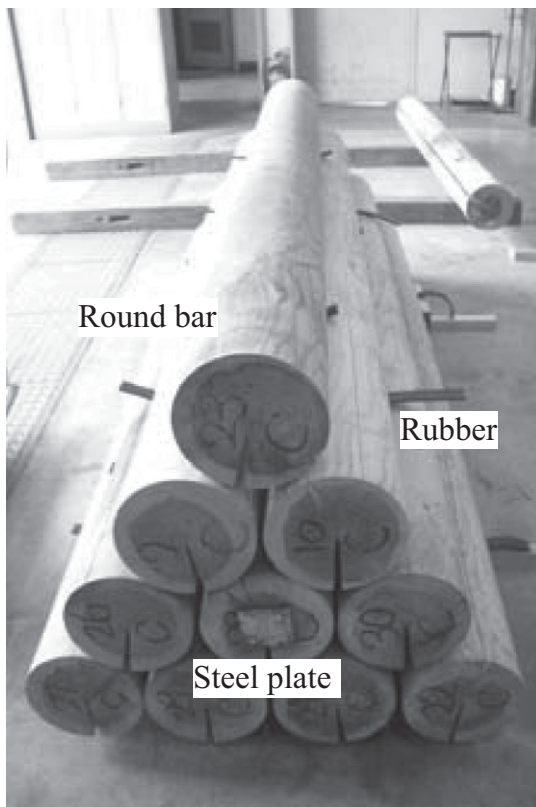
Round bars, stickers, rubber sheet, and the steel plate.
